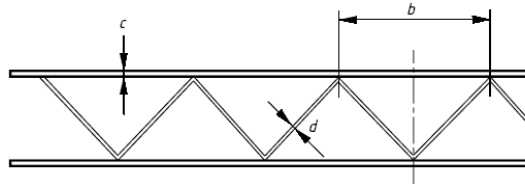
Pre-fabricated trussed type reinforcement.
